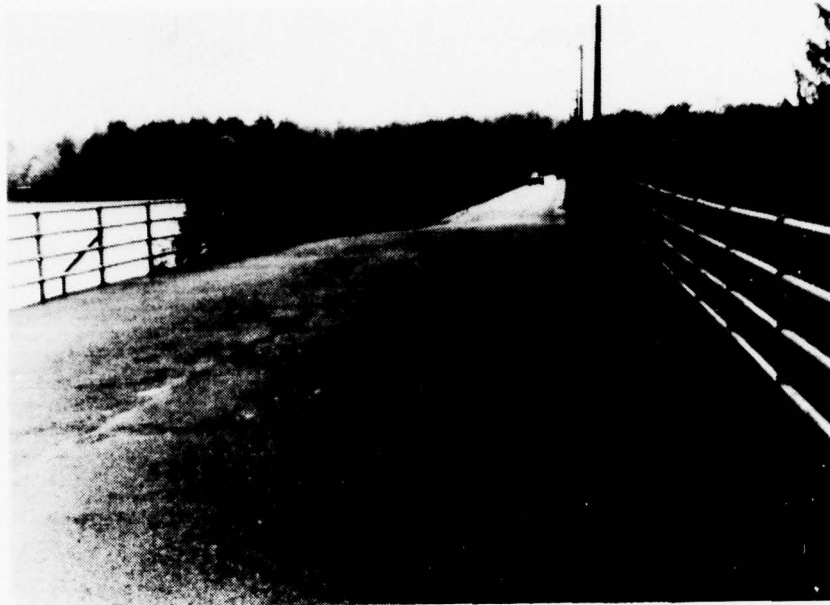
Looking at dam crest along Church Road toward left abutment from spillway bridge on right abutment
